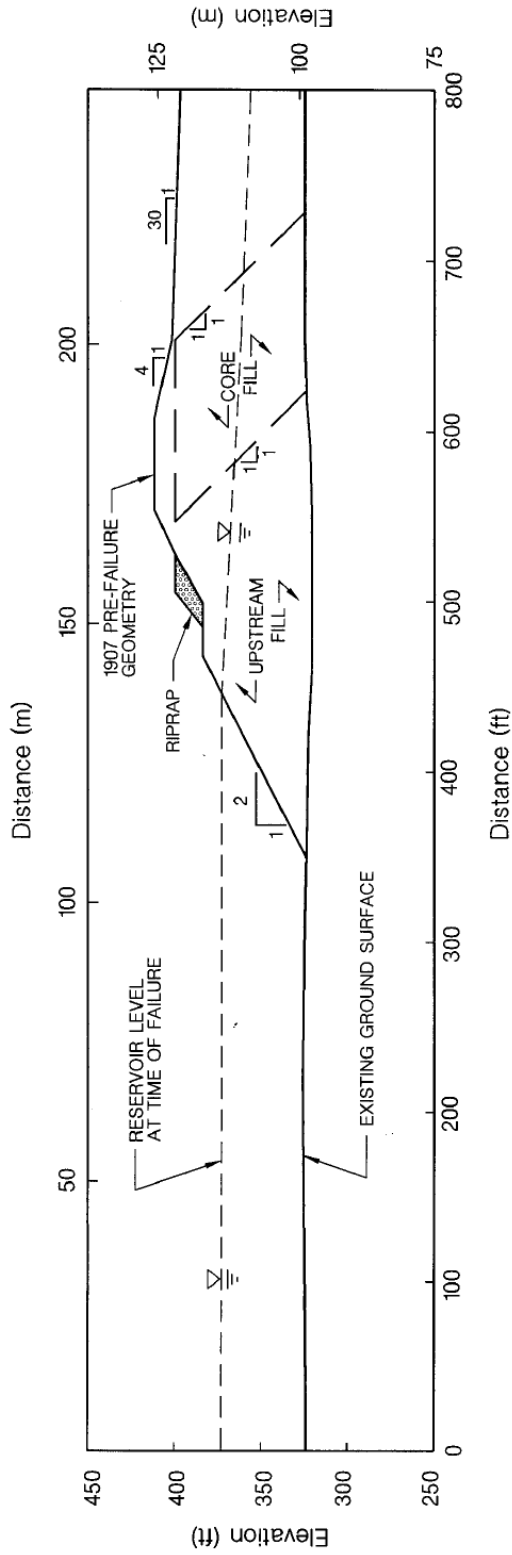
Pre-failure cross-section of the North Dike of Wachusett Dam at Station 23+20 (from Olson et. al, 2000).
